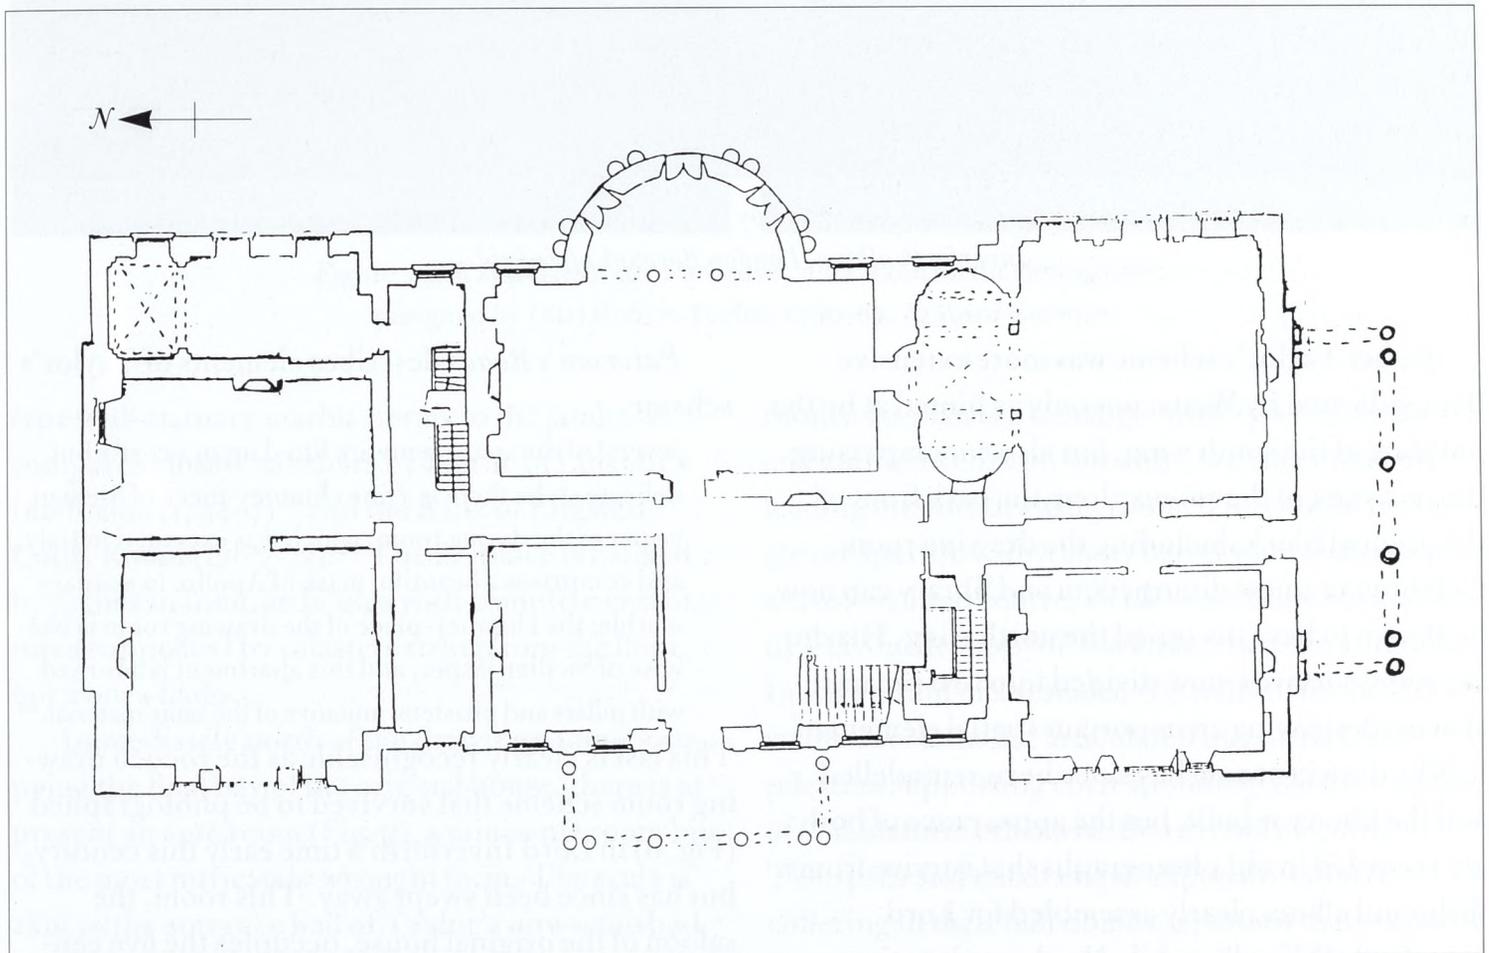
Arno's Grove, reconstructed ground floor plan of the house c. 1779 (the detail of the south wing partly conjectural).
